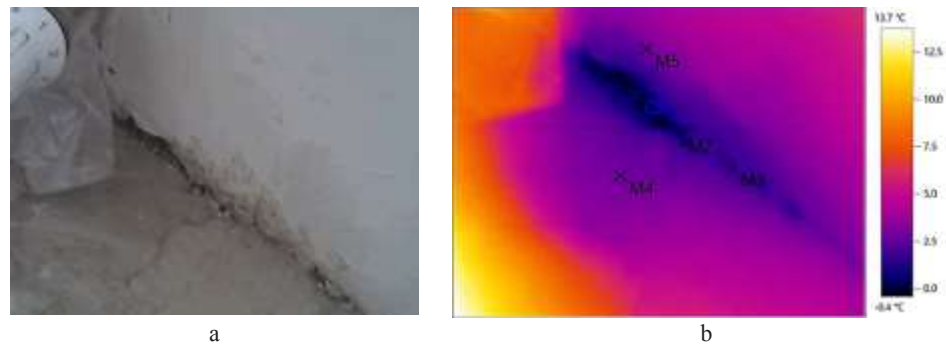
Thermogram of the exterior wall envelope of room No. 8: a - full-scale photo of the wall; b - thermogram of the wall (M1=0.4°C, M2=0.8°C, M3=1.7°C, M4=2.7°C, M5=2.7°C, CS1=-0.4°C).
